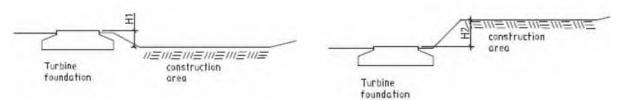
Example of foundation when Construction Area is below the top of foundation.
